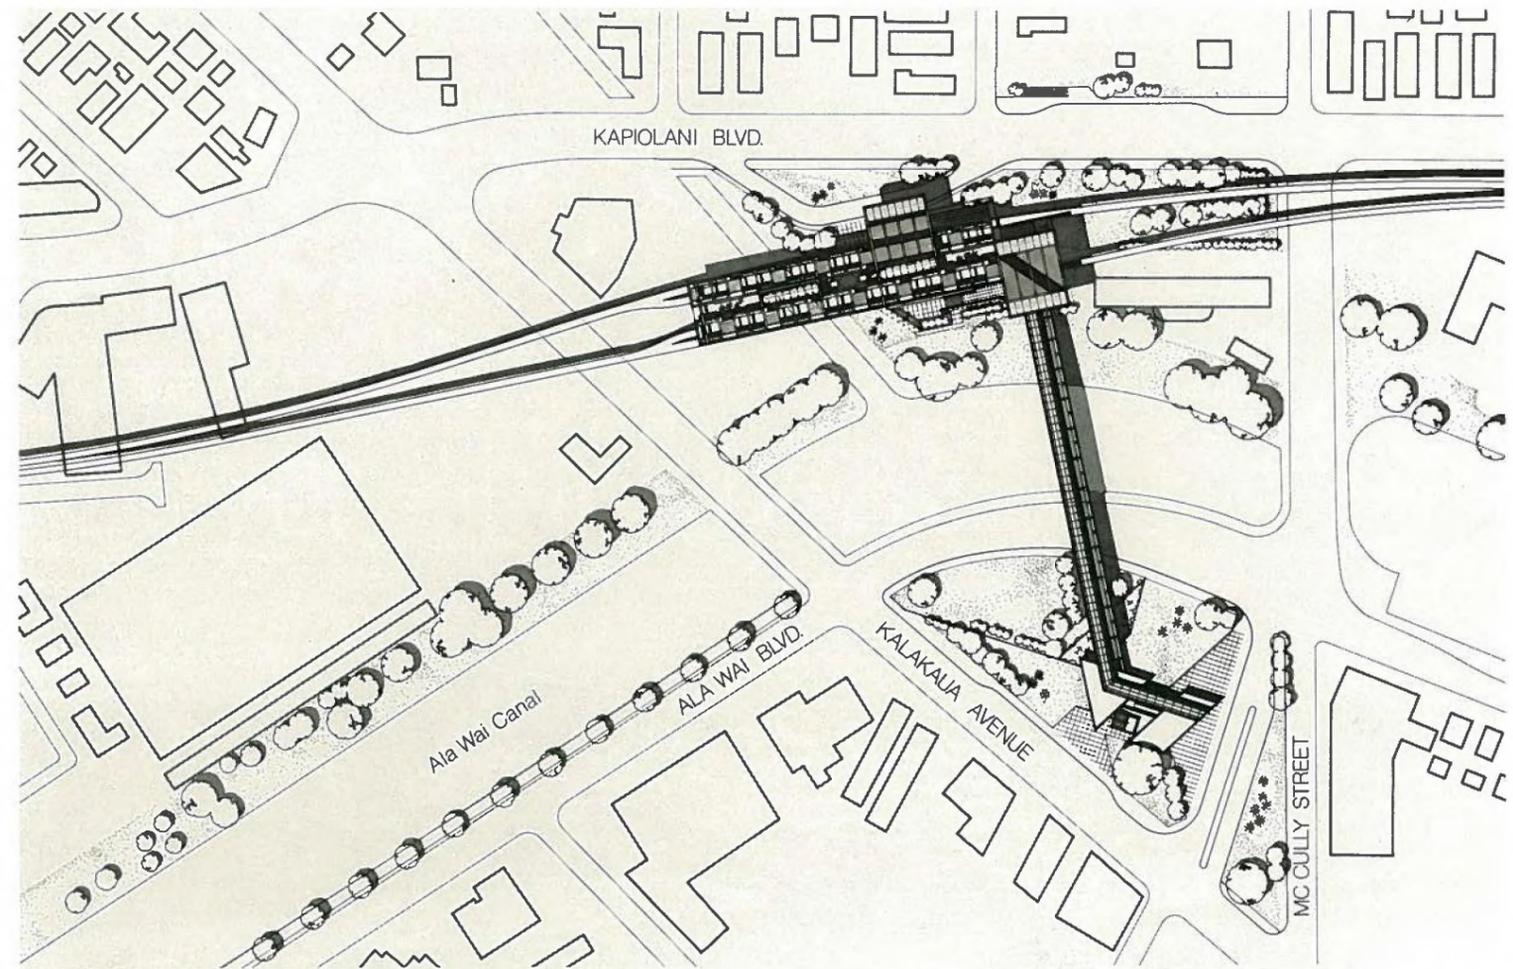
Waikiki Urban Design Concept Site Plan
